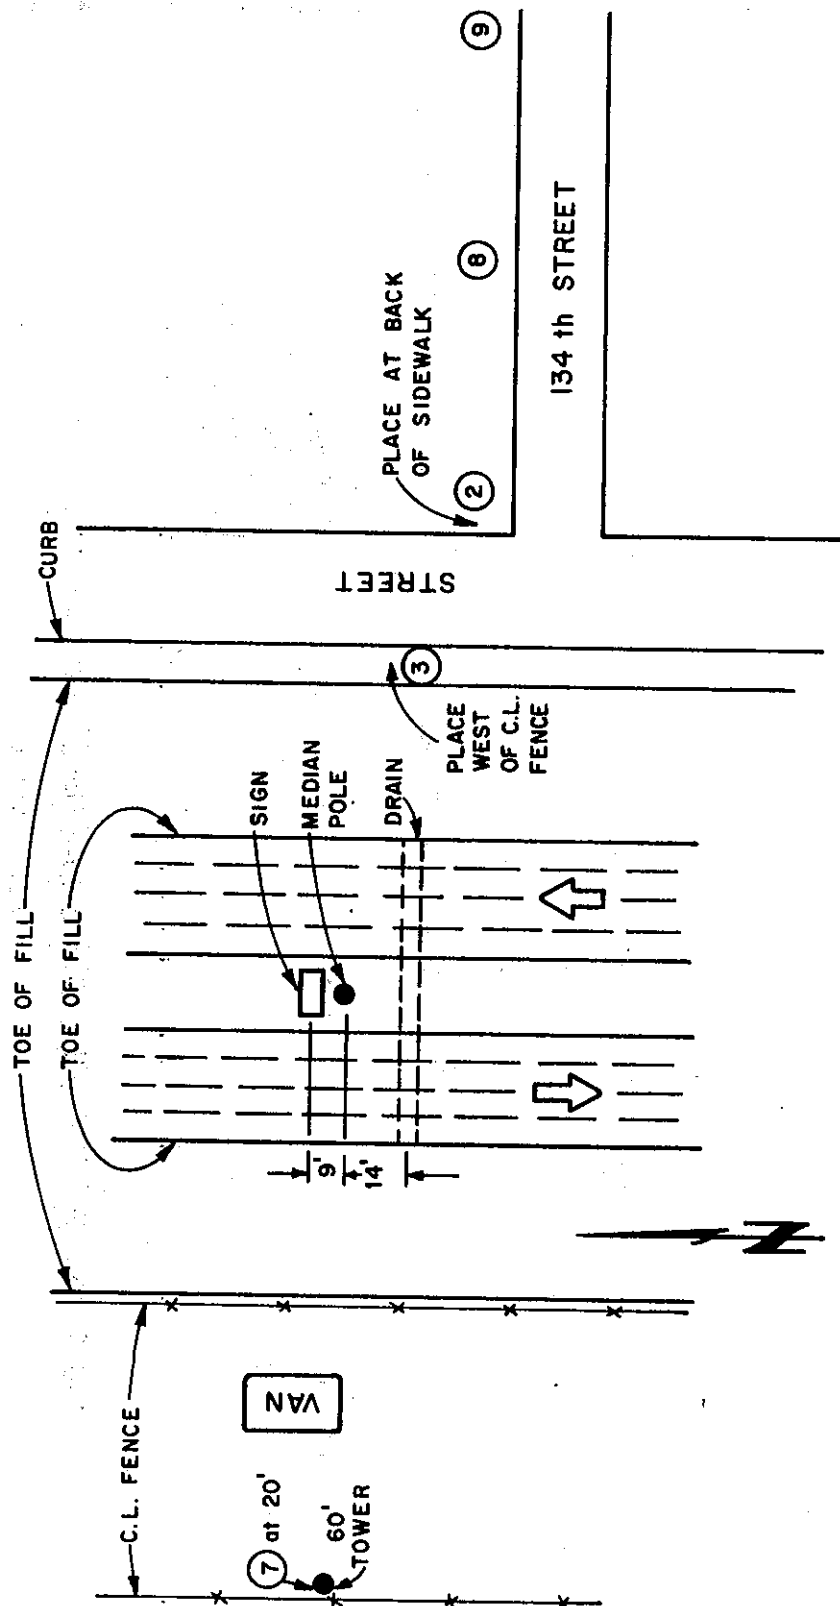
PLAN VIEW, SITE 6, SAN DIEGO FWY.
